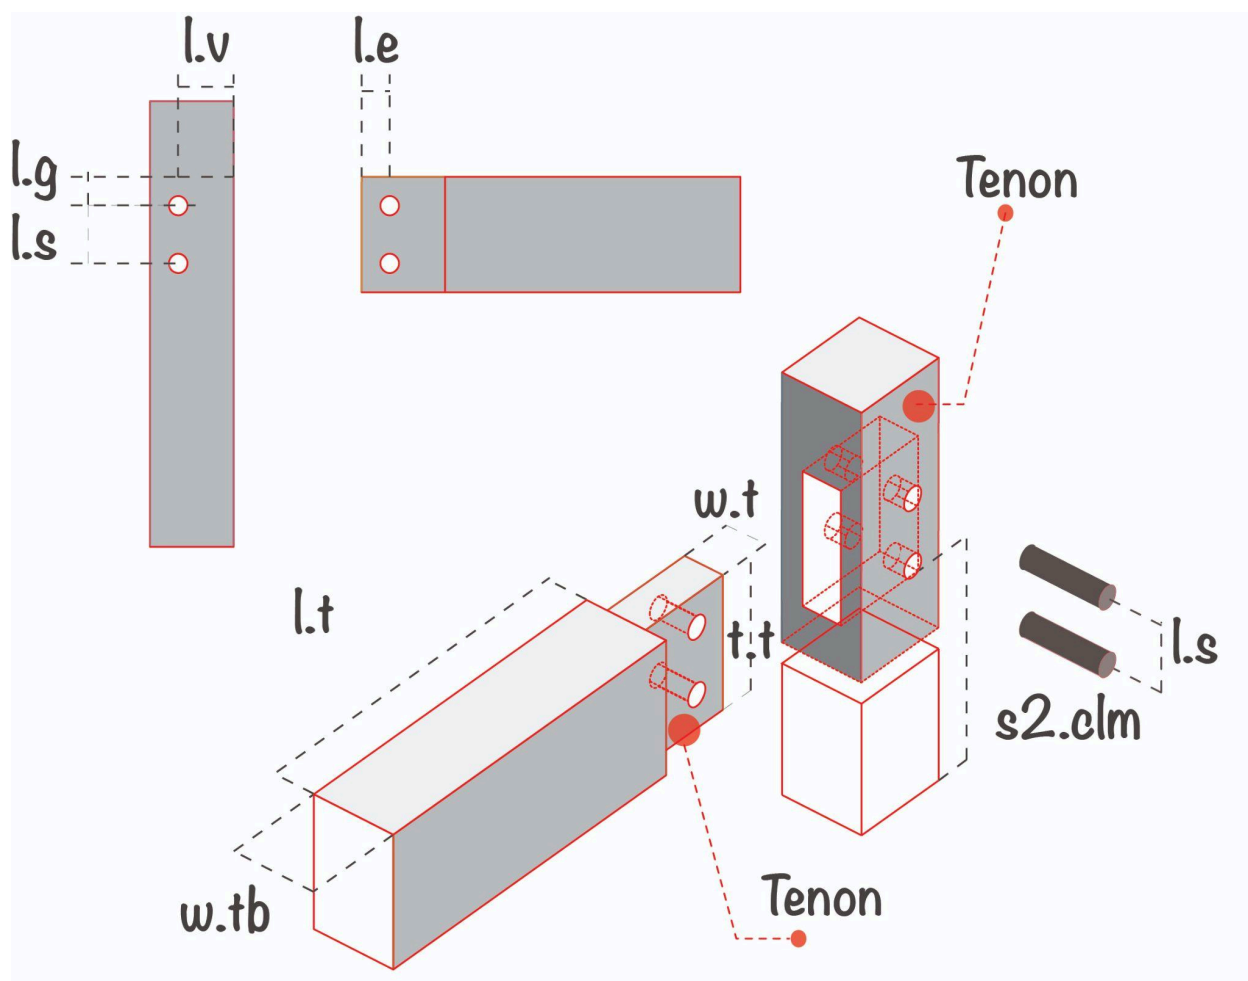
A drawing of Pegged Mortise and Tenon with Dimensional Details
